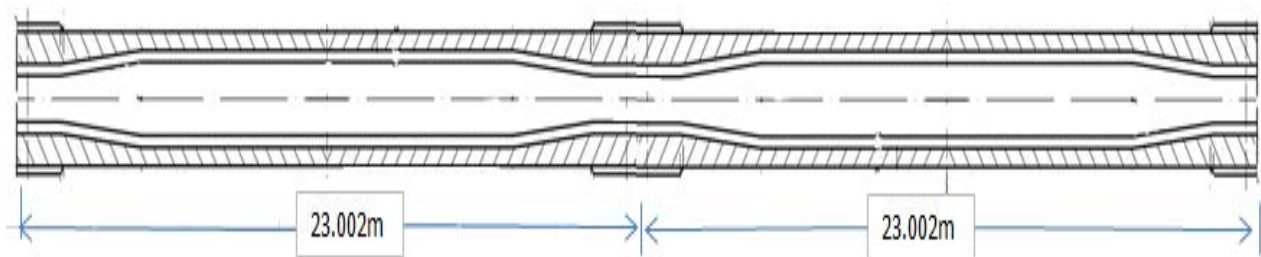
the longitudinal cross-section of the 46.004m two-span continuous box-girder
